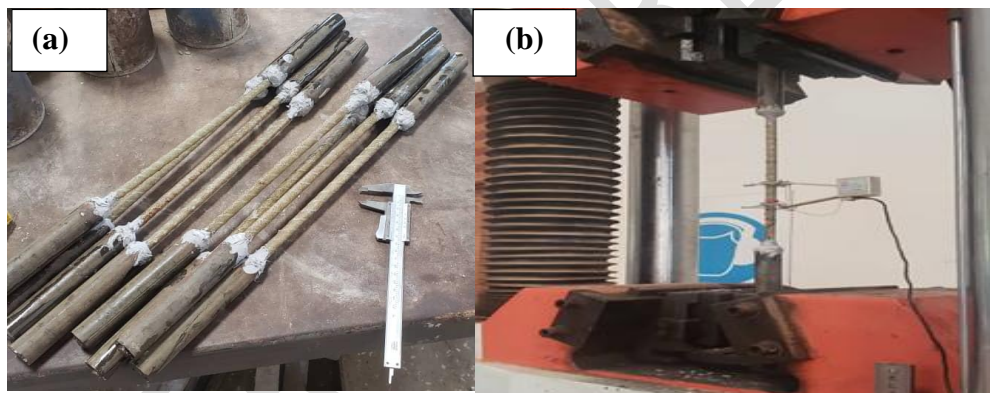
GFRP reinforcing bar tensile test using UTM: (a) preparation of test specimens, (b) testing.
